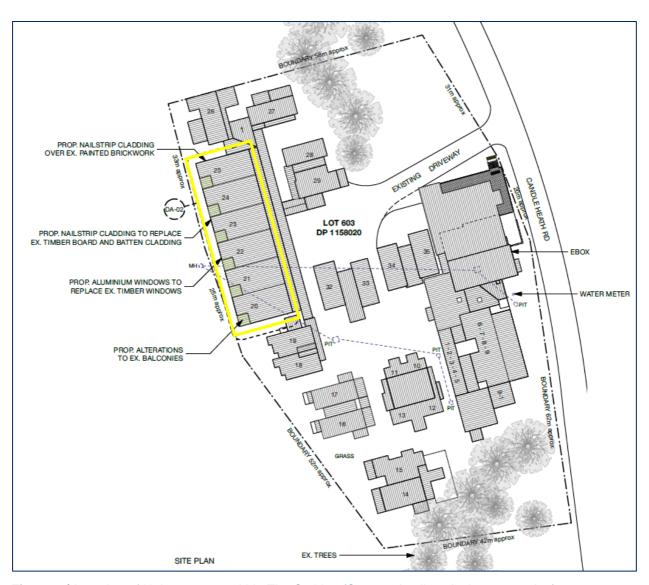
| Location of Units 20 to 25 within The Stables (Source: Applicant's documentation)
